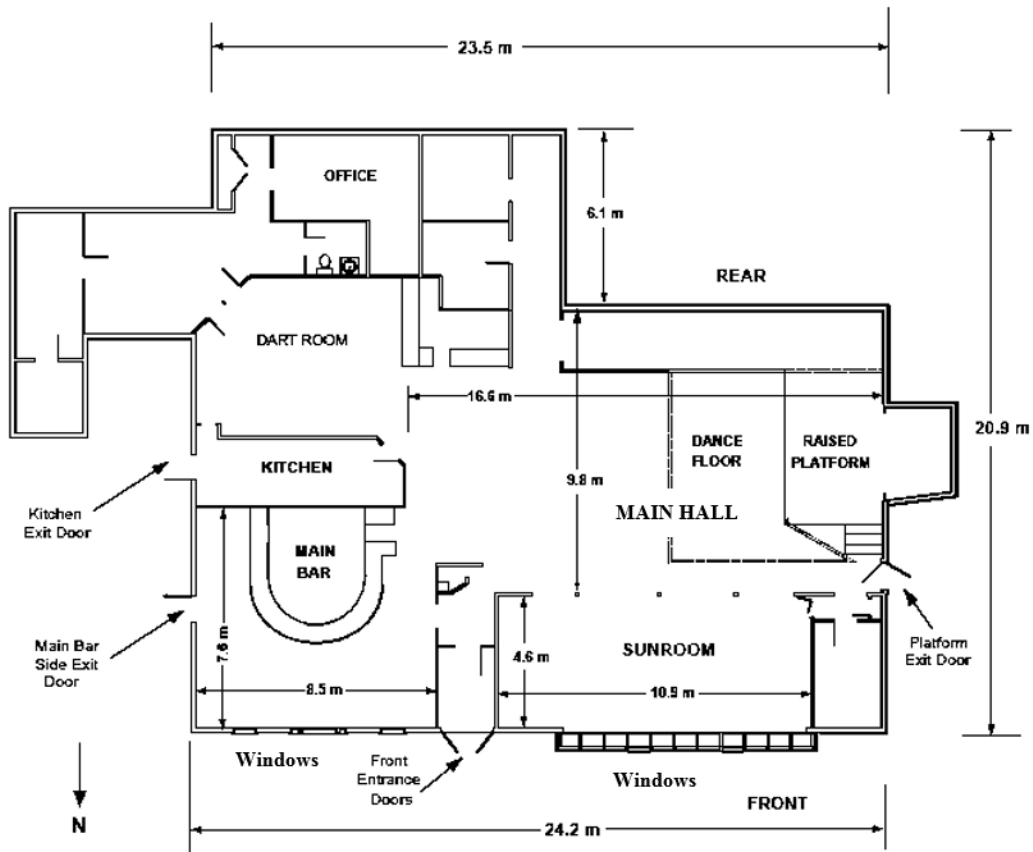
The Station building floor plan (adopted from Grosshandler *et al.* 2005)
